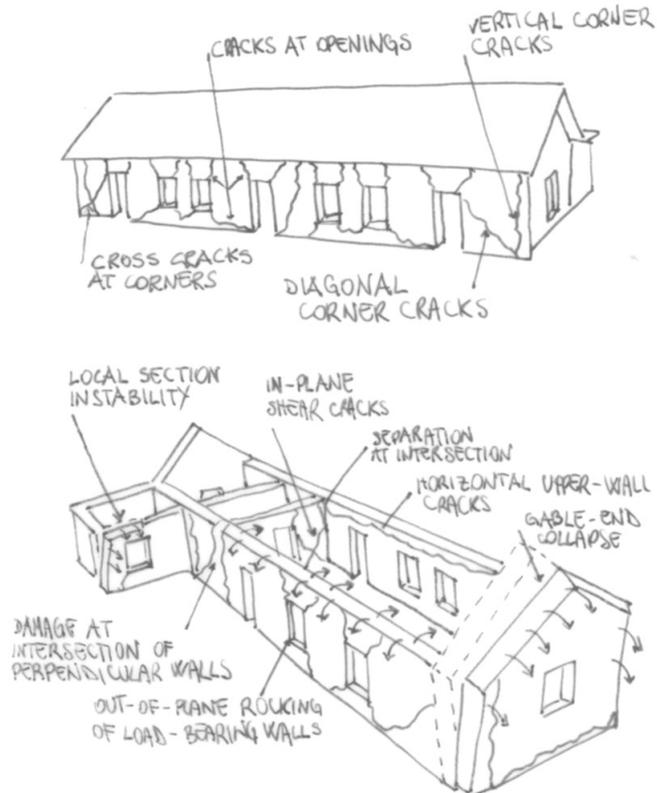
Typical seismic damage models observed in one-floor historic adobe buildings
